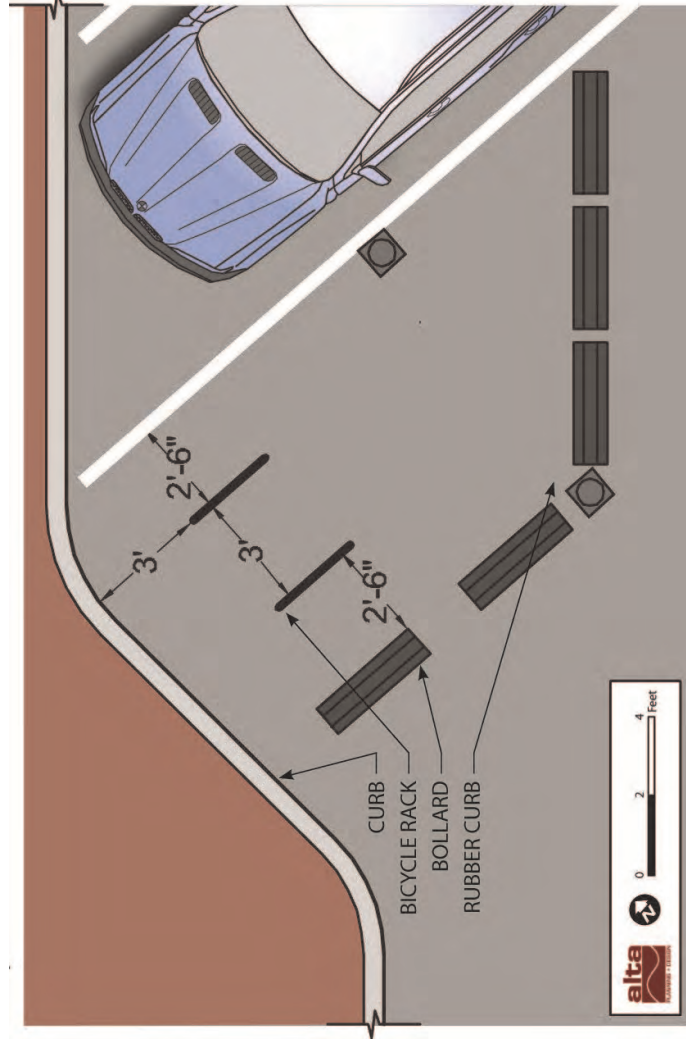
3rd Avenue and San Mateo Drive Bicycle Parking Plan View
